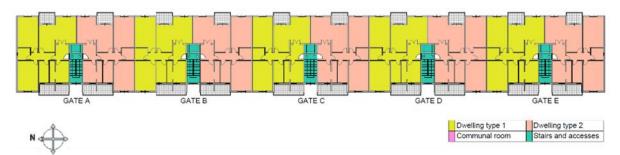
Large multi-family house – orientation and geometry of the apartments and shape of the building plant.
